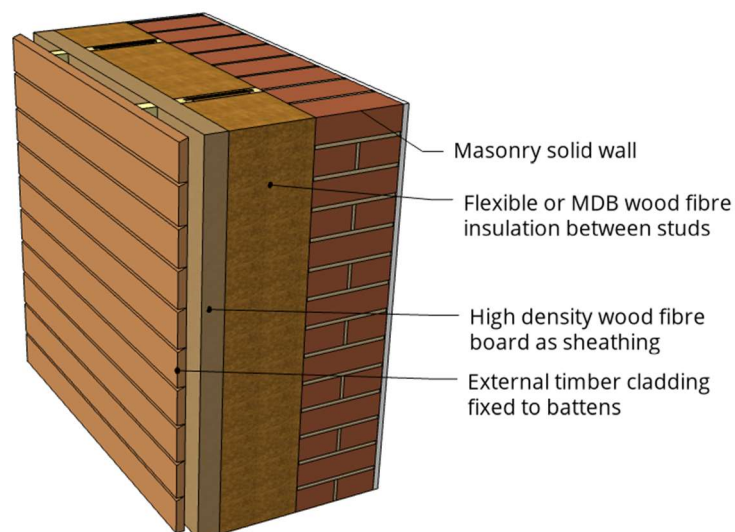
Timber panel installed externally to cover the masonry wall. Source: Green Spec.
